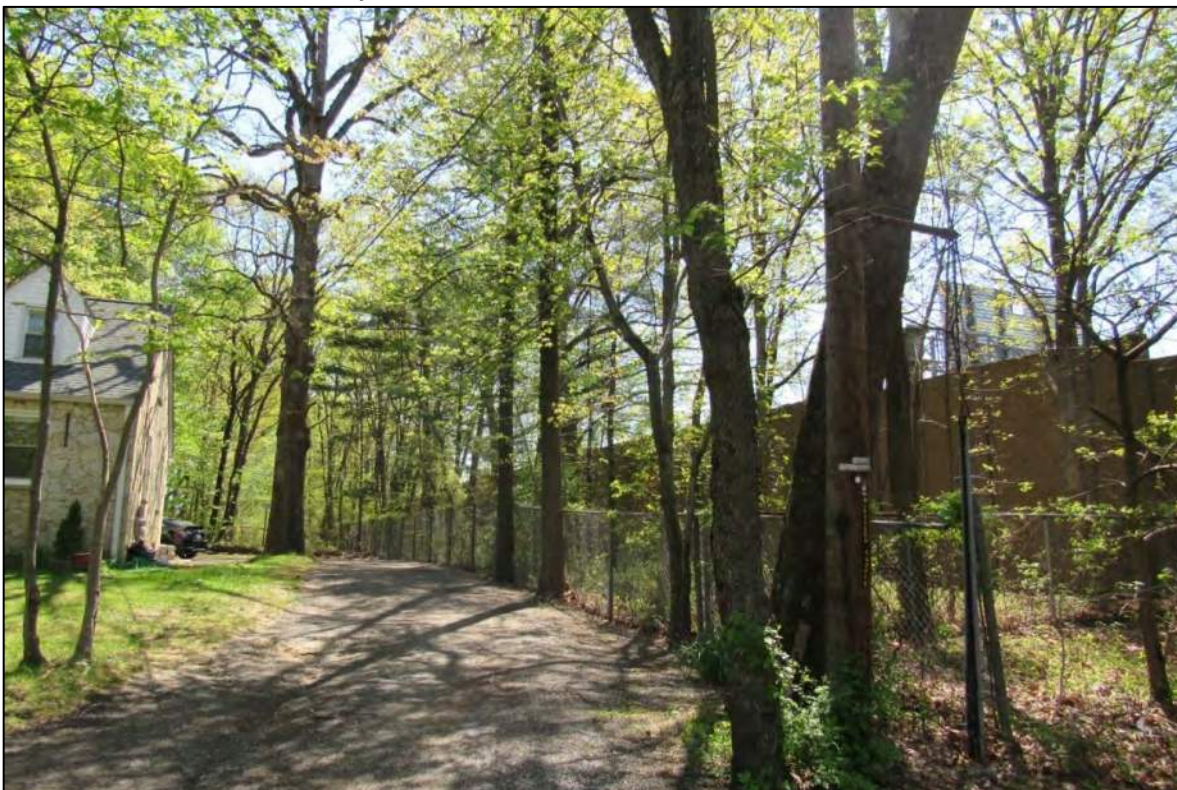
of 2: Looking Southeast Towards I-495 Sound Barrier
